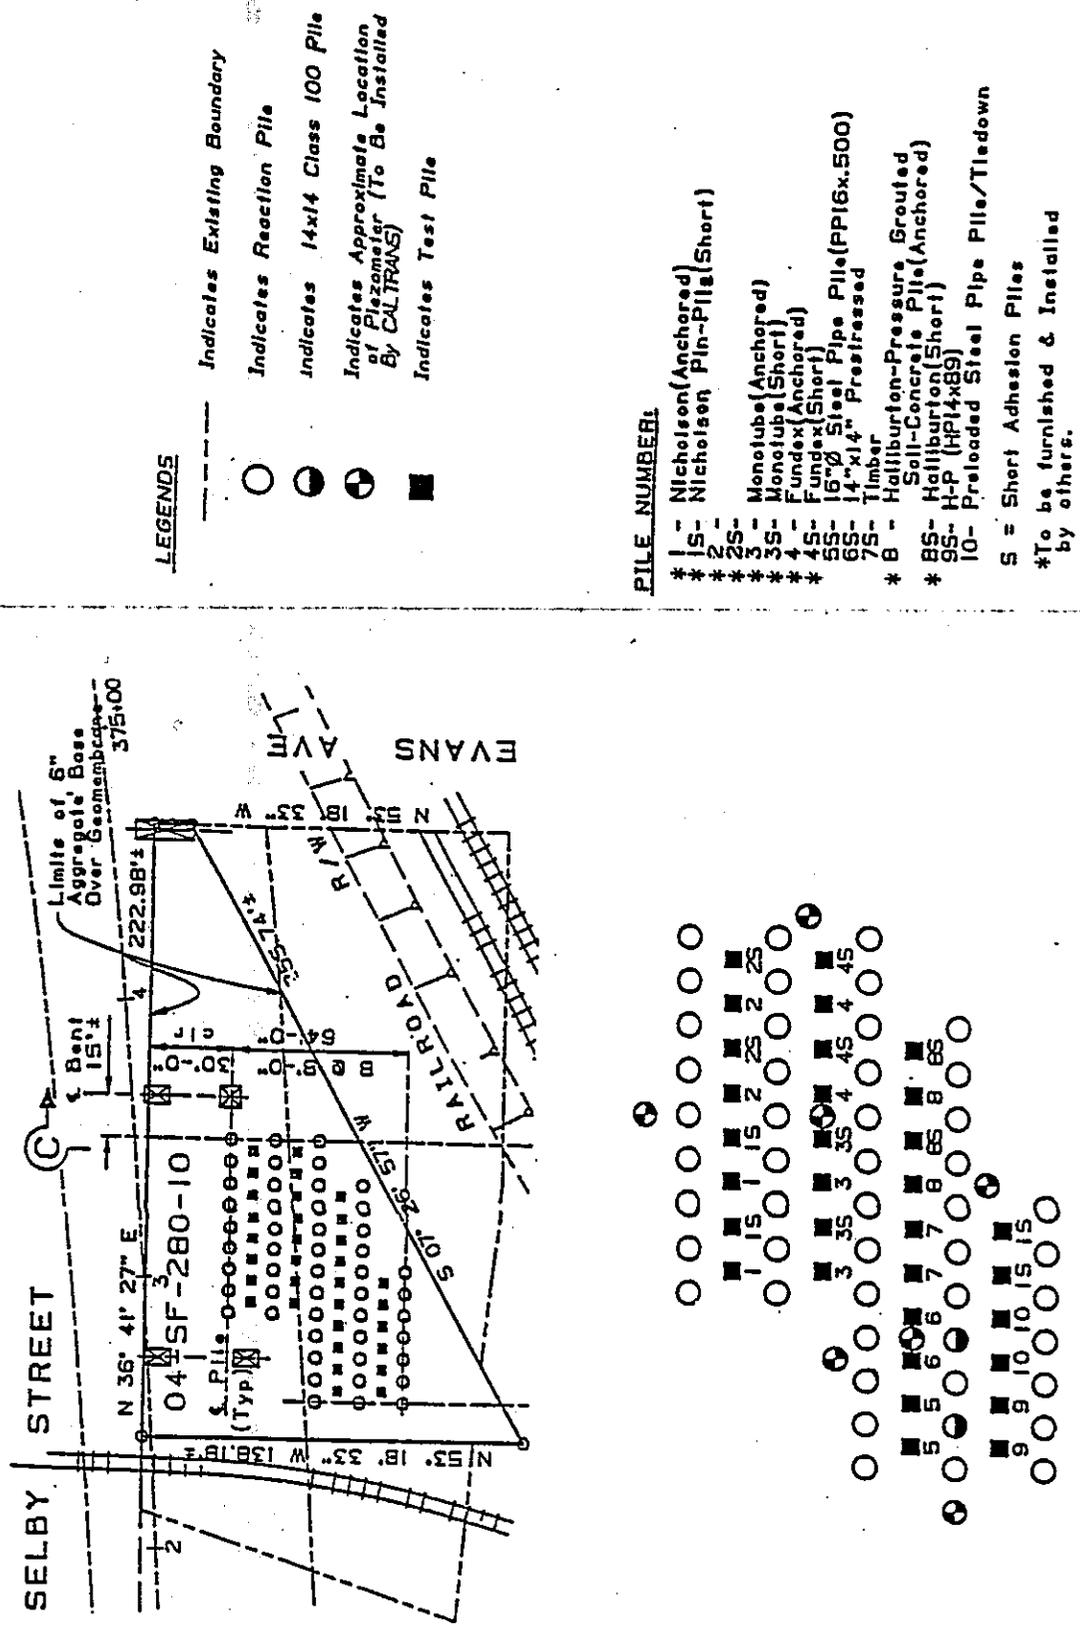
Location and General Layout of Highway 280 Pile Load Test Facility
